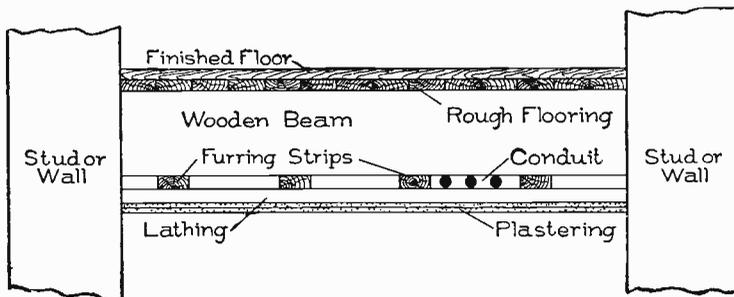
Running Conductors Concealed under Floor in Wooden Frame Building.
